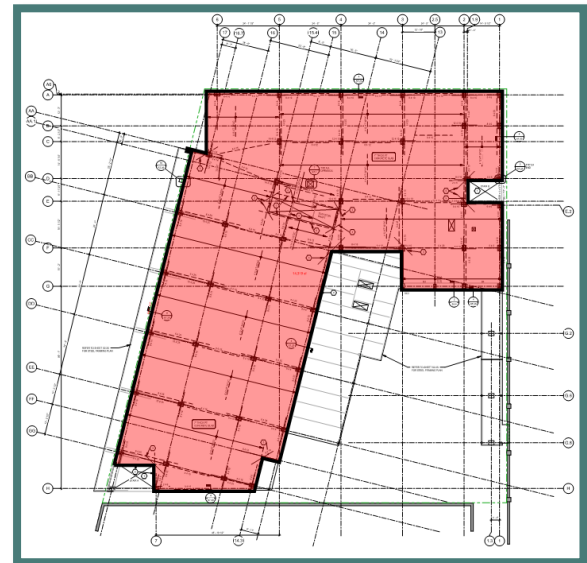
The area of floor two, which was used for the analysis of the PT slab (S2.2R - Second Floor Reinforcing Plan)
